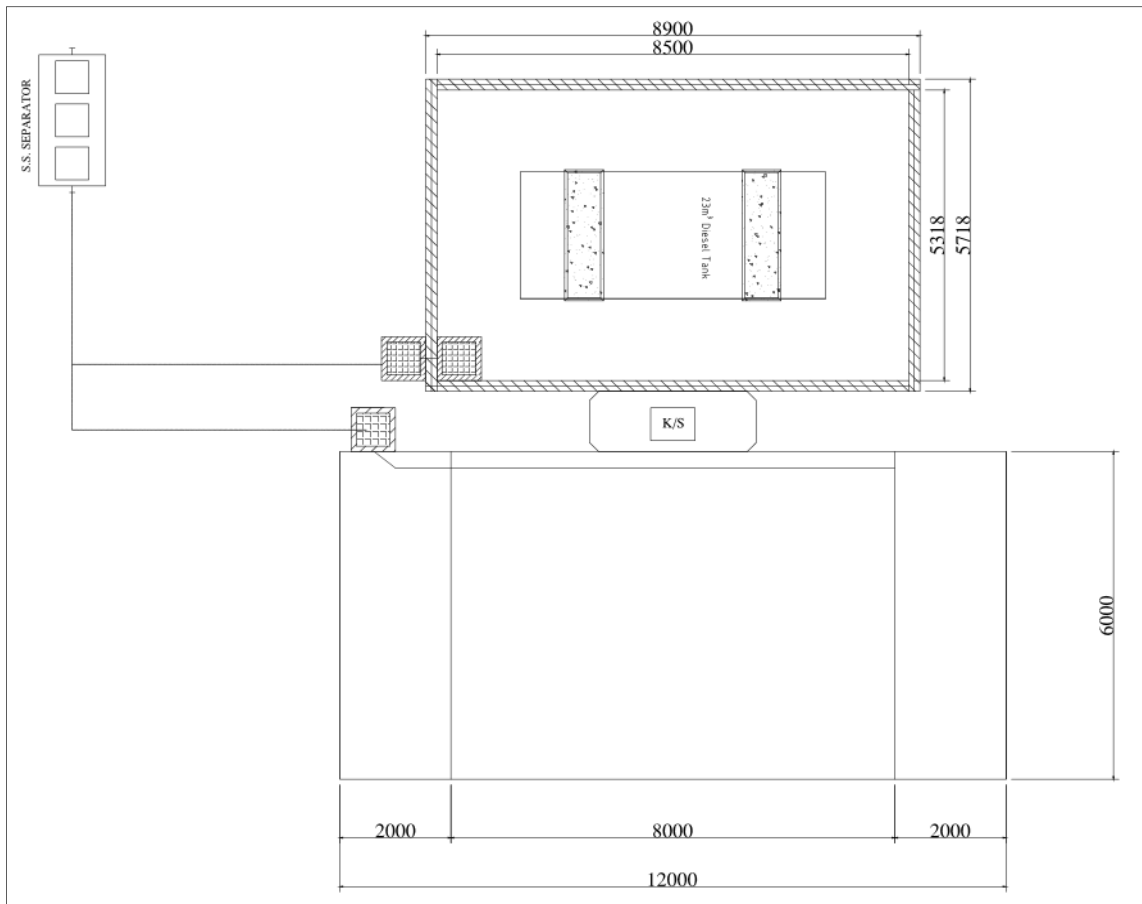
Design of installation set-up, with concrete floor at dispensing areas
